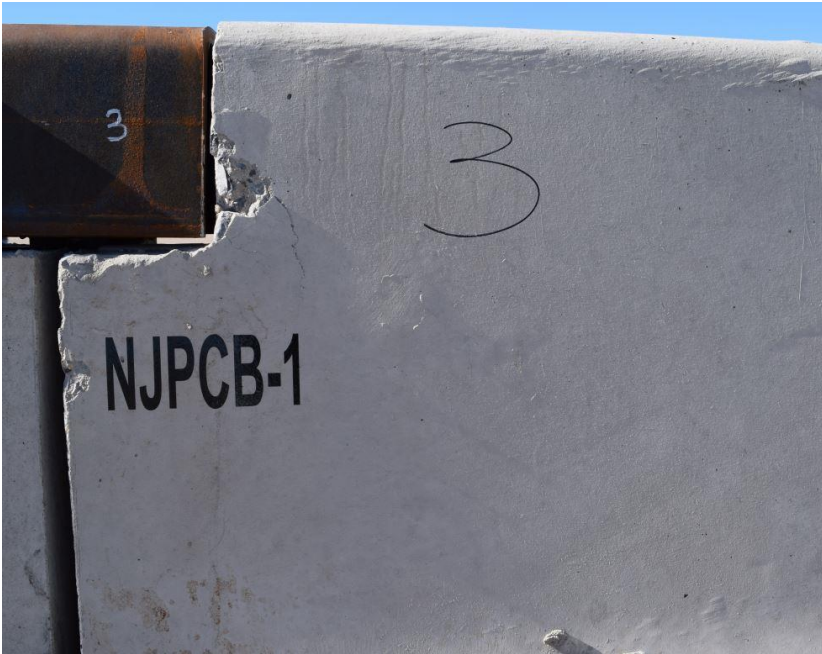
Barrier No. 3 – Traffic and Back Side Damage, Test No. NJPCB-1
